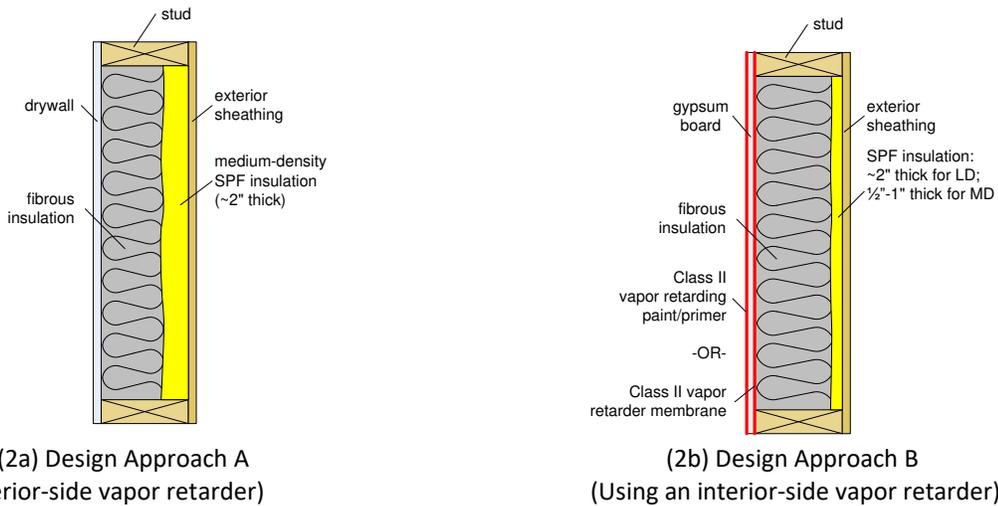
HYBRID INSULATION WALL DESIGNS—VERTICAL SECTION VIEW
